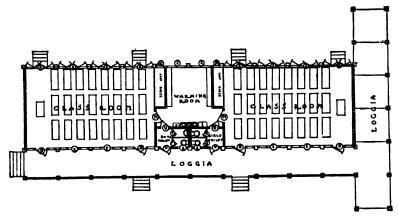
Floor plan of open-air school unit, St. Louis.
